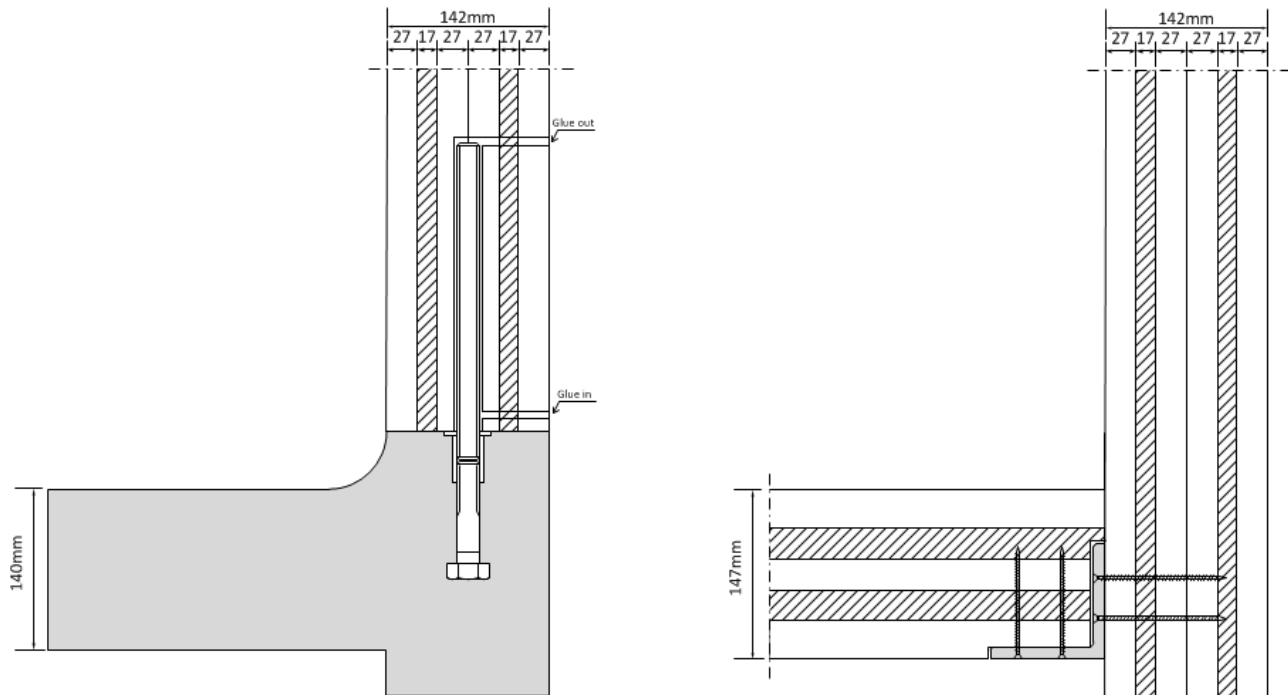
Cross section wall-floor concrete (left) and CLT (right)
